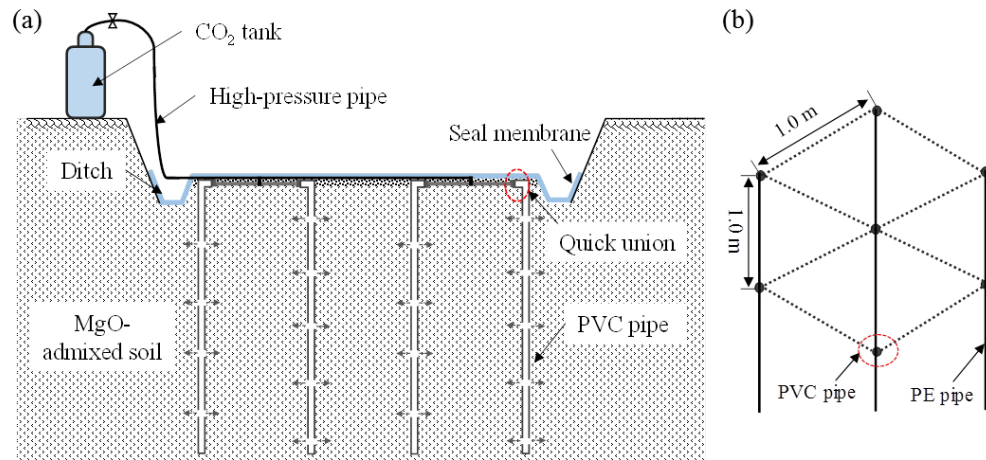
Arrangement diagram of vent pipes: (a) cross-sectional drawing; and (b) plane drawing.
